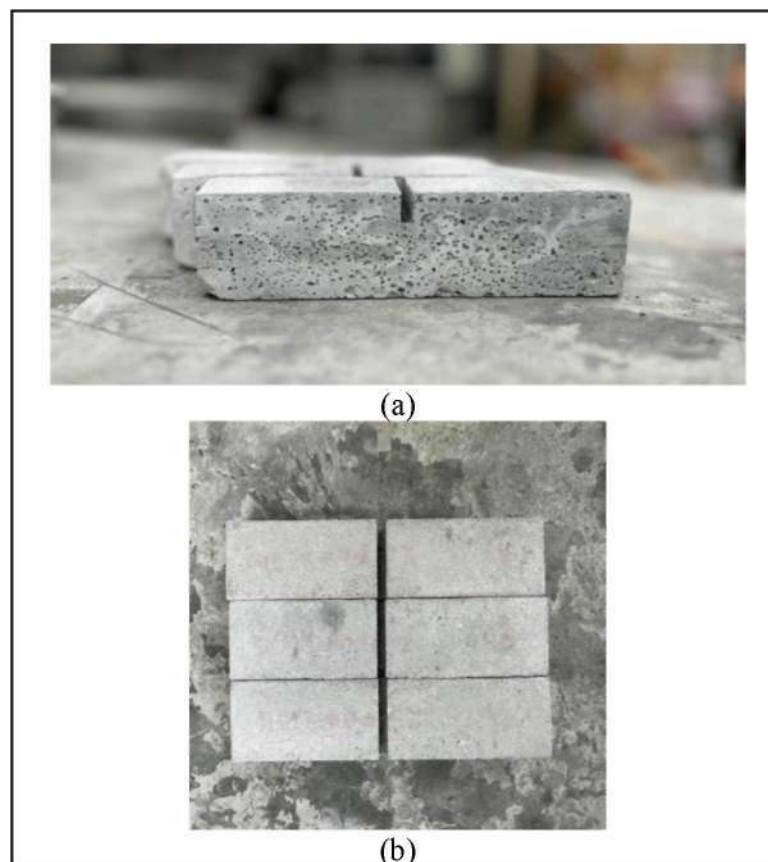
Single Edge Notch (SEN) specimens (a) Side View (b) Top View
